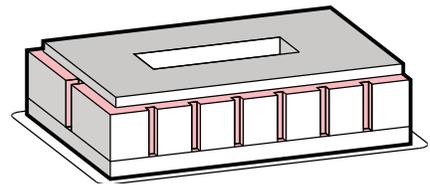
BE1 - APPLY ONE ADDITIONAL BULK/MASSING CONTROL (EXAMPLE: SIGNIFICANT BREAKS + UPPER FLOOR STEPBACK EXAMPLE)
